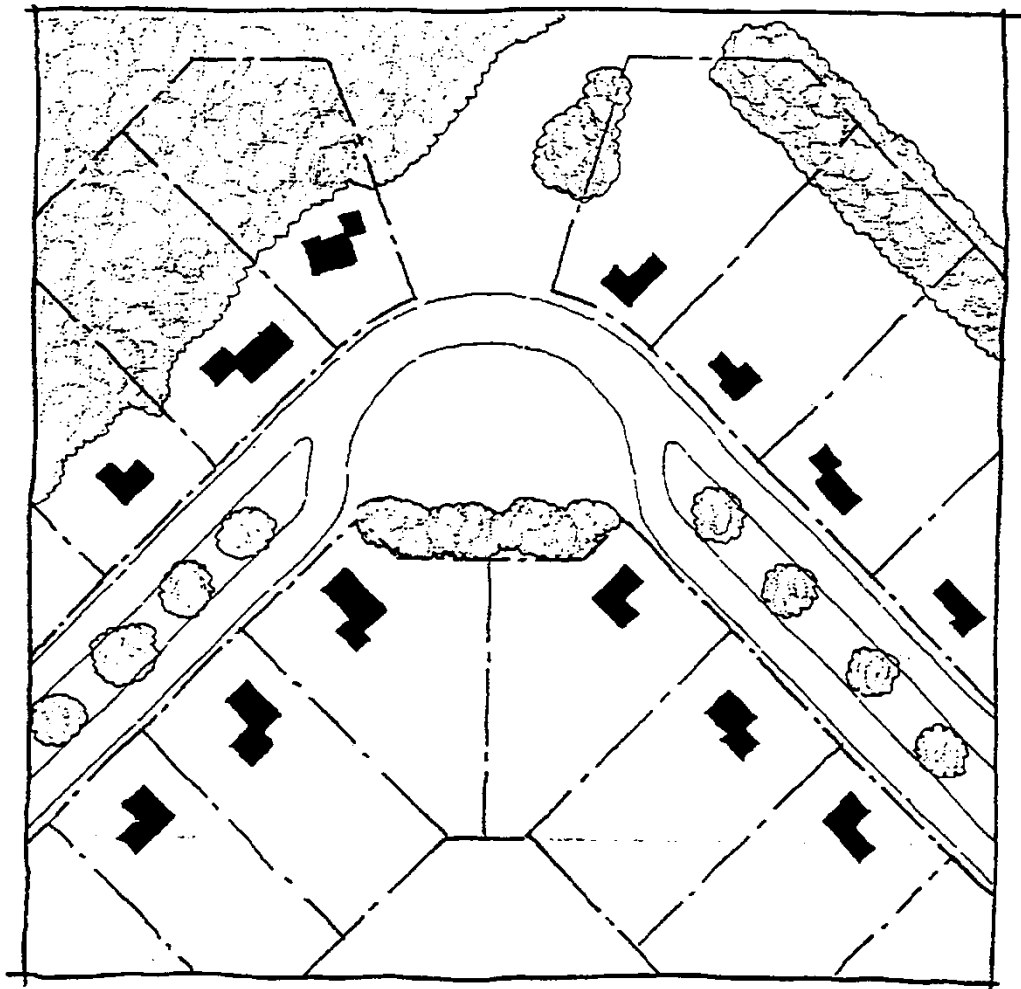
E(3) An example neighborhood cluster oriented toward a corner park or green streetscape.
